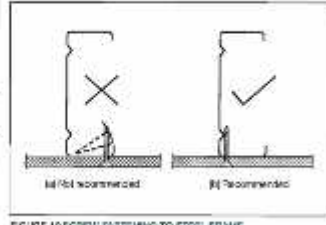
SCREW FASTENING TO STEEL FRAME
